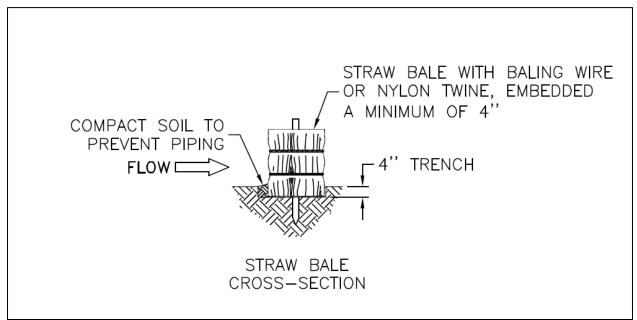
Typical Hay Bale Check Dam (NOTE: Without proper installation, which is rarely done, hay bale check dams always fail.)
